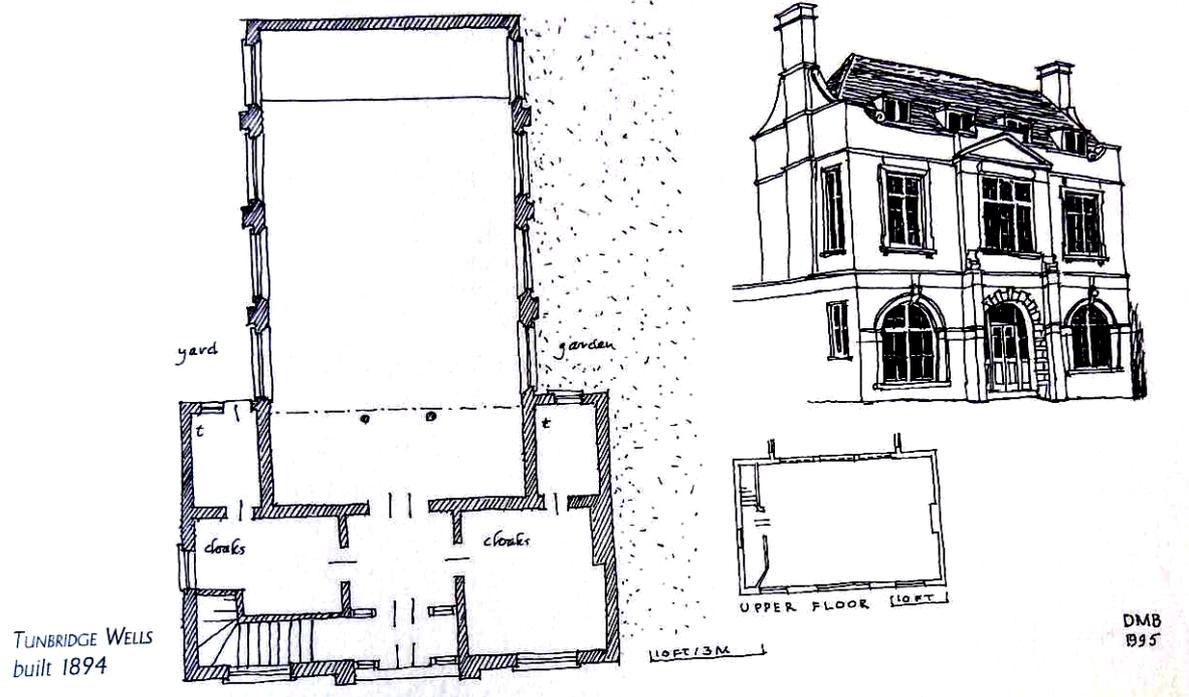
Plan and elevation, from Butler, vol. 1, p. 289
